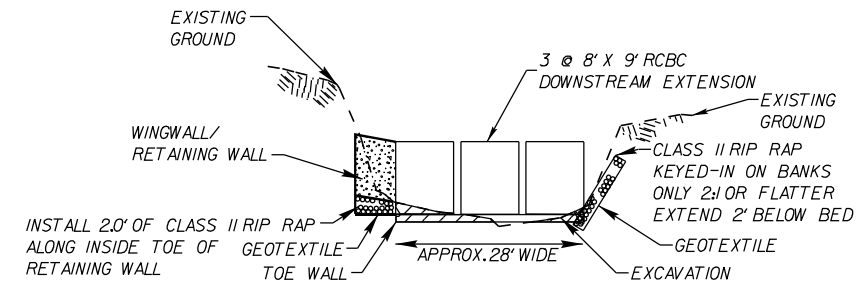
INLET CHANNEL IMPROVEMENTS
